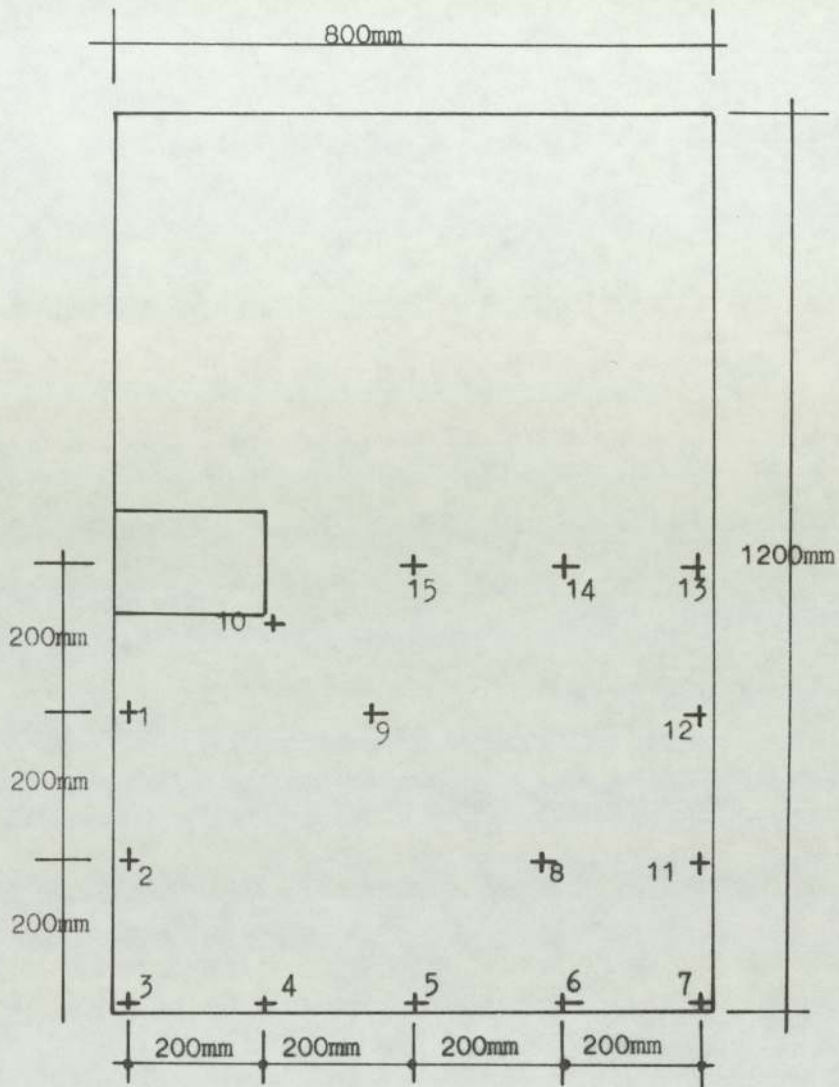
Dial gauges (deflectometers) layout for a typical specimen.
